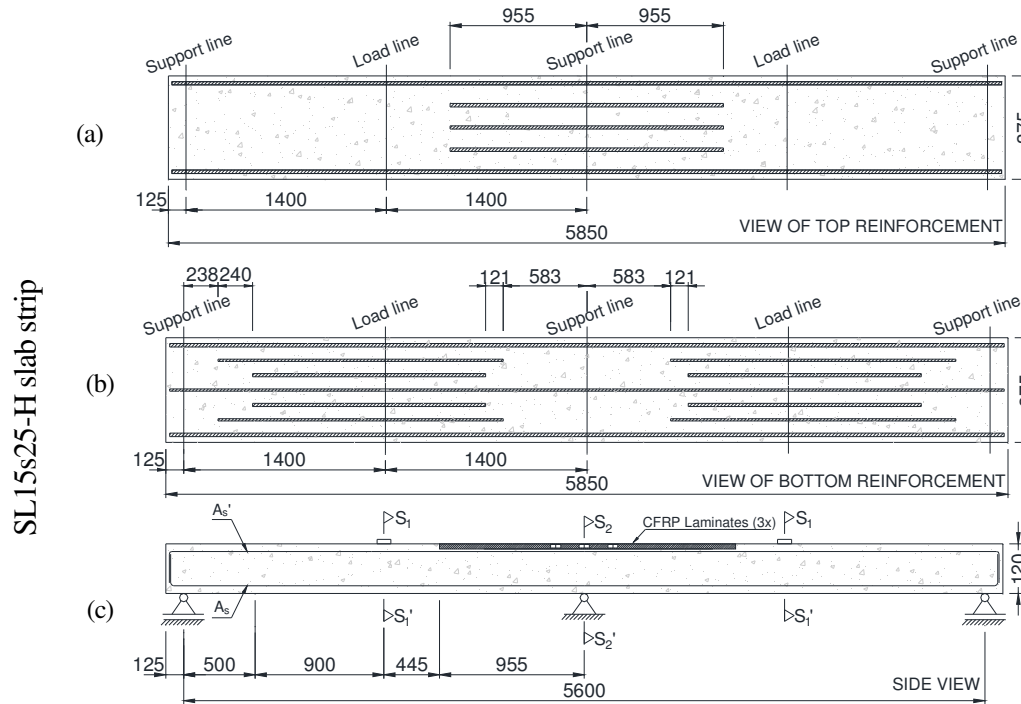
Arrangement of the (a-b) longitudinal steel reinforcement and (c) CFRP laminates of the SL15s25-H slab strip.
